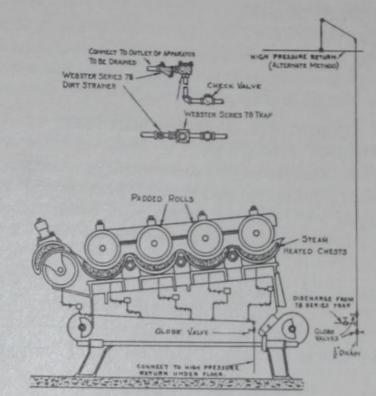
Method of Connecting Webster Series "78" Trap to Five Roll Flat Work Ironer
